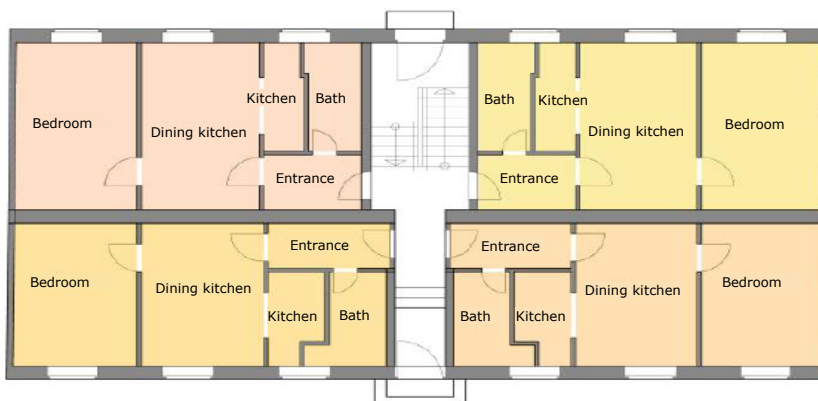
Exemplary floor plan of building Dieselweg No. 15 (Source: Hohensinn ZT GmbH)
